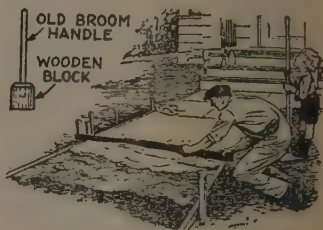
How a concrete walk is laid, and a homemade tamper.
